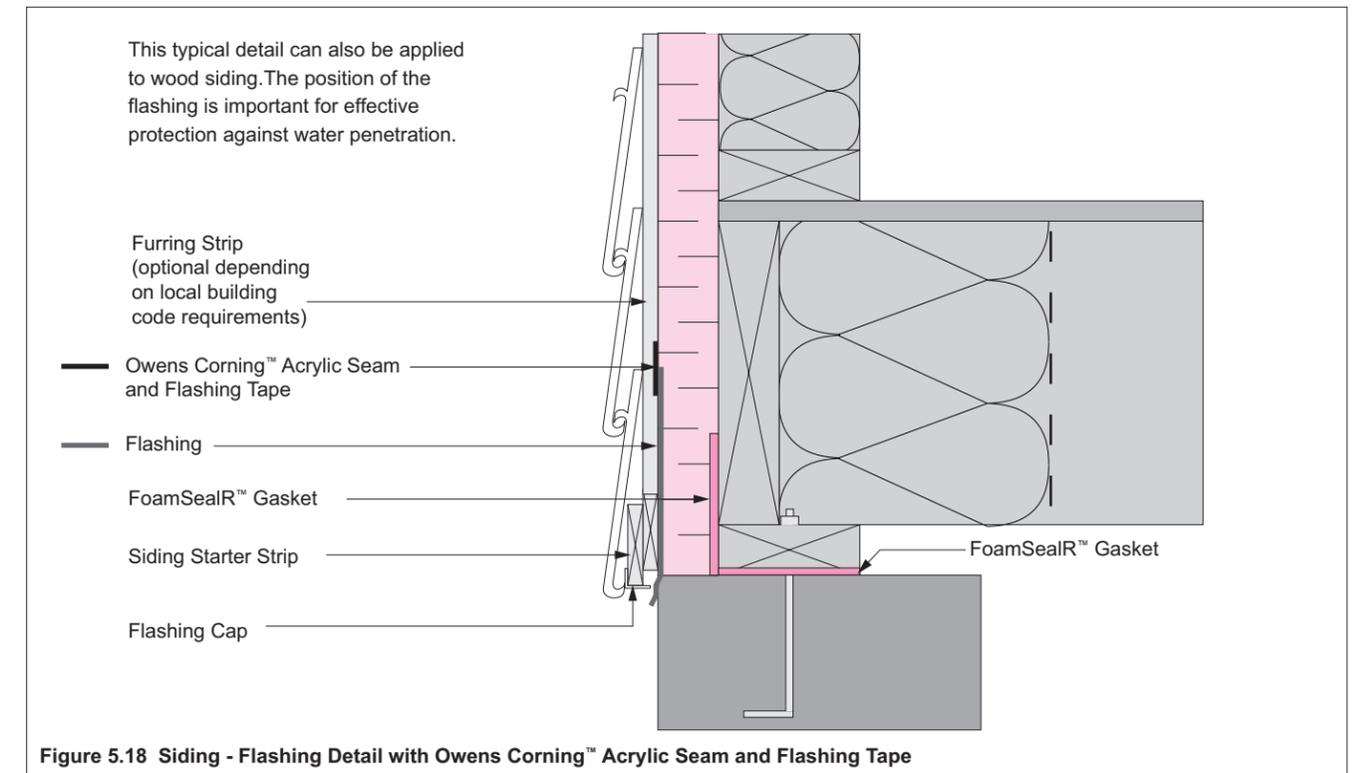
to 5.20 illustrate typical flashing details when metal, wood or vinyl siding is used as an exterior finish. Always refer to the siding manufacturer's installation instructions for correct siding installation procedures.
